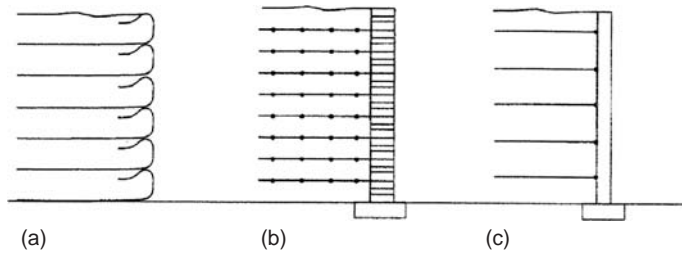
Reinforced retaining wall systems using geosynthetics; (a) with wrap-around geosynthetic facing, (b) with segmental or modular concrete block, and (c) with full-height (propped) precast panels.
